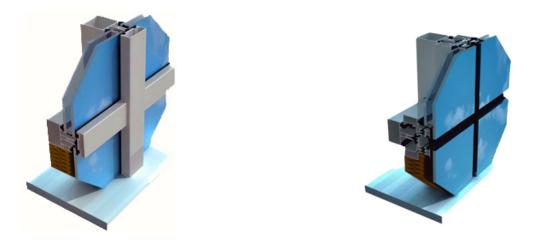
Column-beam facade system FIGURE 3. Structural facade system
